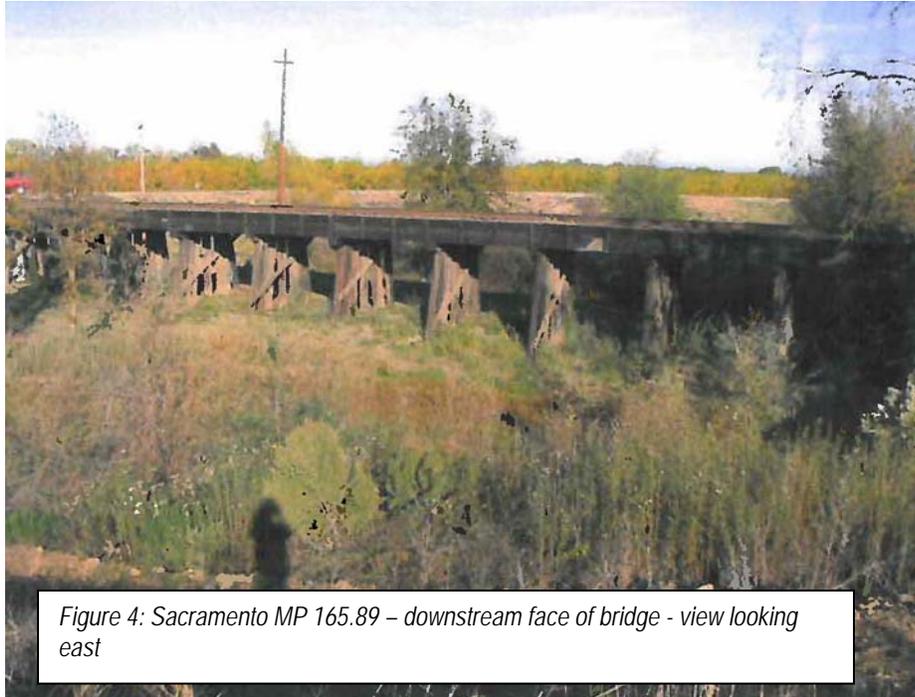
Sacramento MP 165.89 – downstream face of bridge - view looking east
